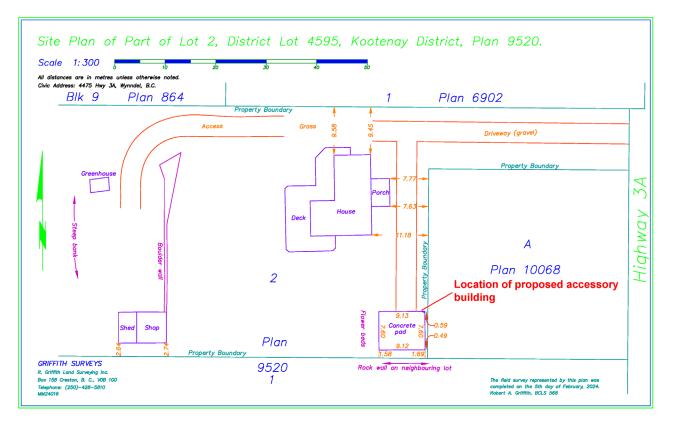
Site Plan showing location of existing concrete pad and proposed accessory building.
